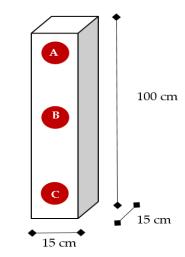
Column dimension and The zones A, B, C, for drilling concrete cores
